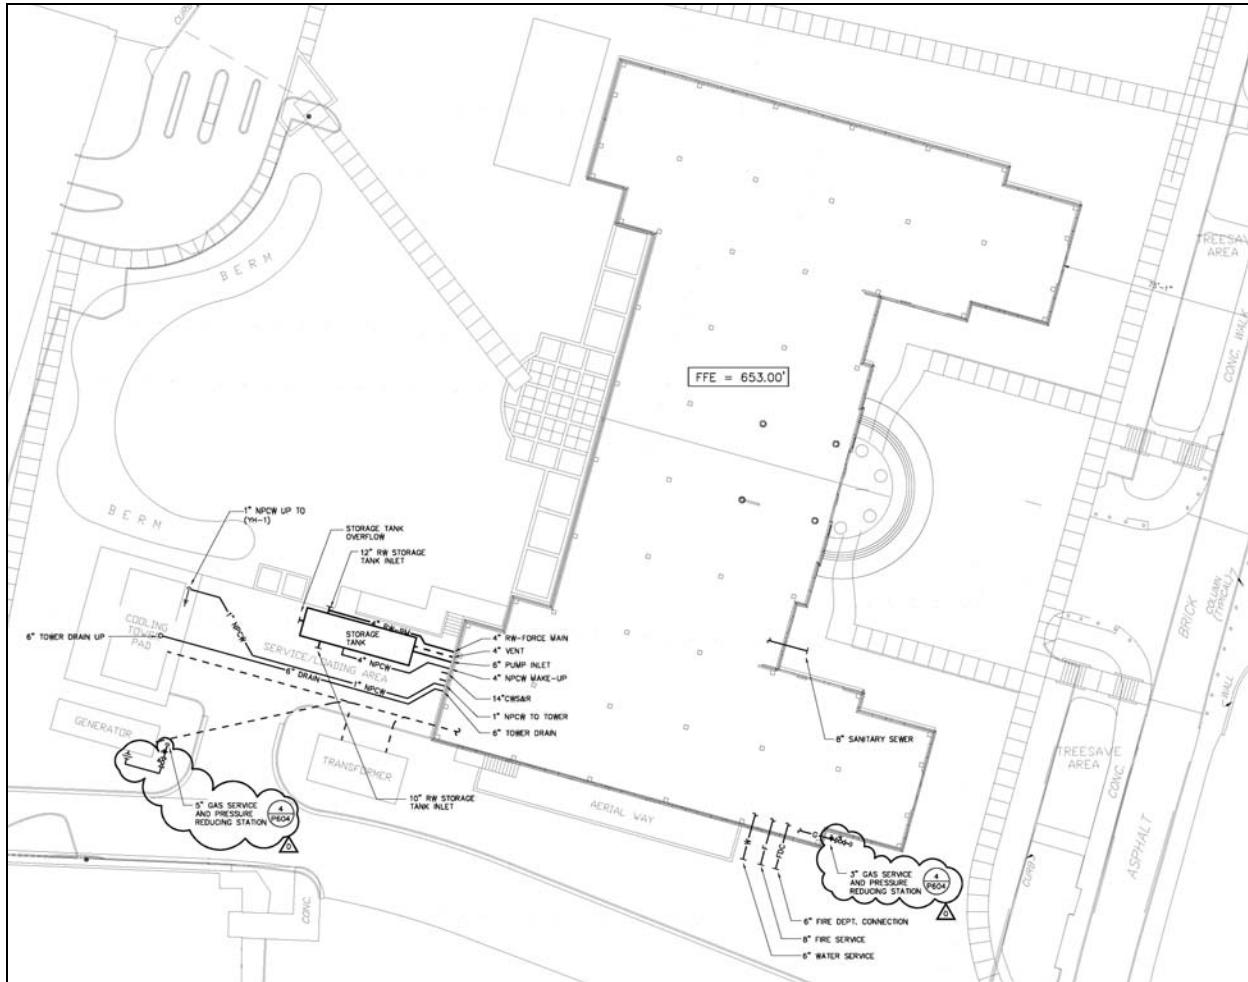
Site Plumbing Plan showing cistern location, Coverdell Center, University of Georgia (HOK Architects)
